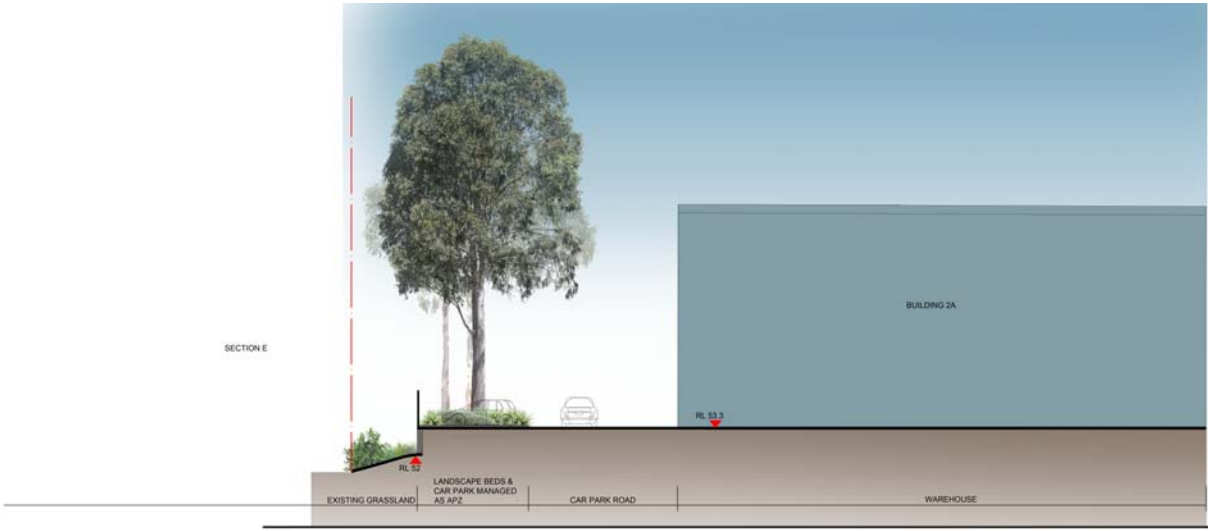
SECTION THROUGH WESTERN BOUNDARY (BUILDING 2A)
